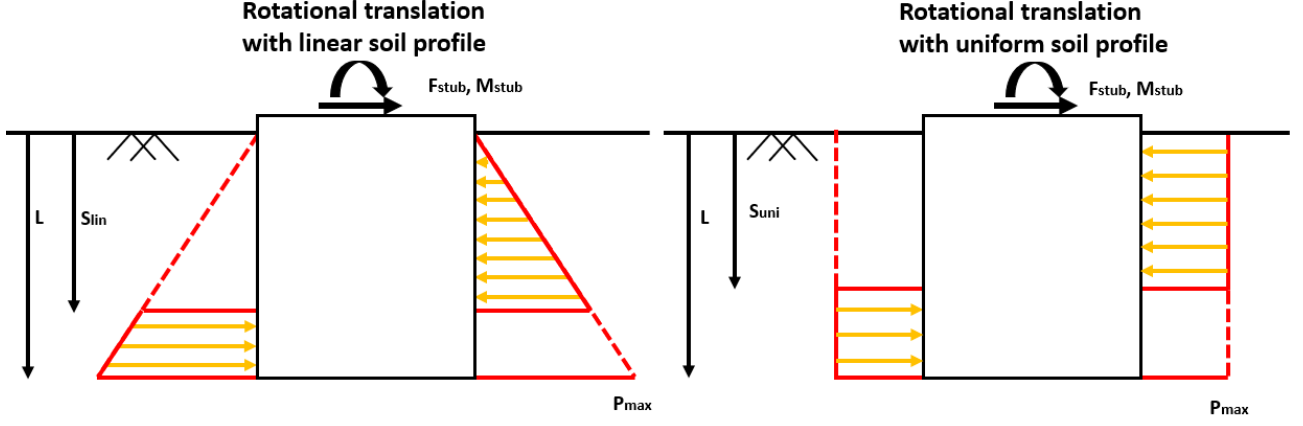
Lateral maximum soil pressure profiles on a shallow foundation pile.
